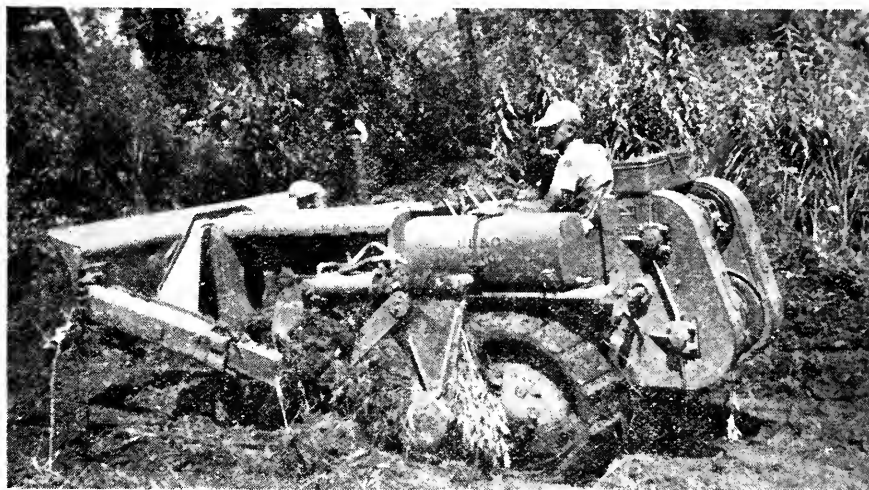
Crawler tractor with dozer blade and winch for clearing fence line and pulling and stretching wire.
